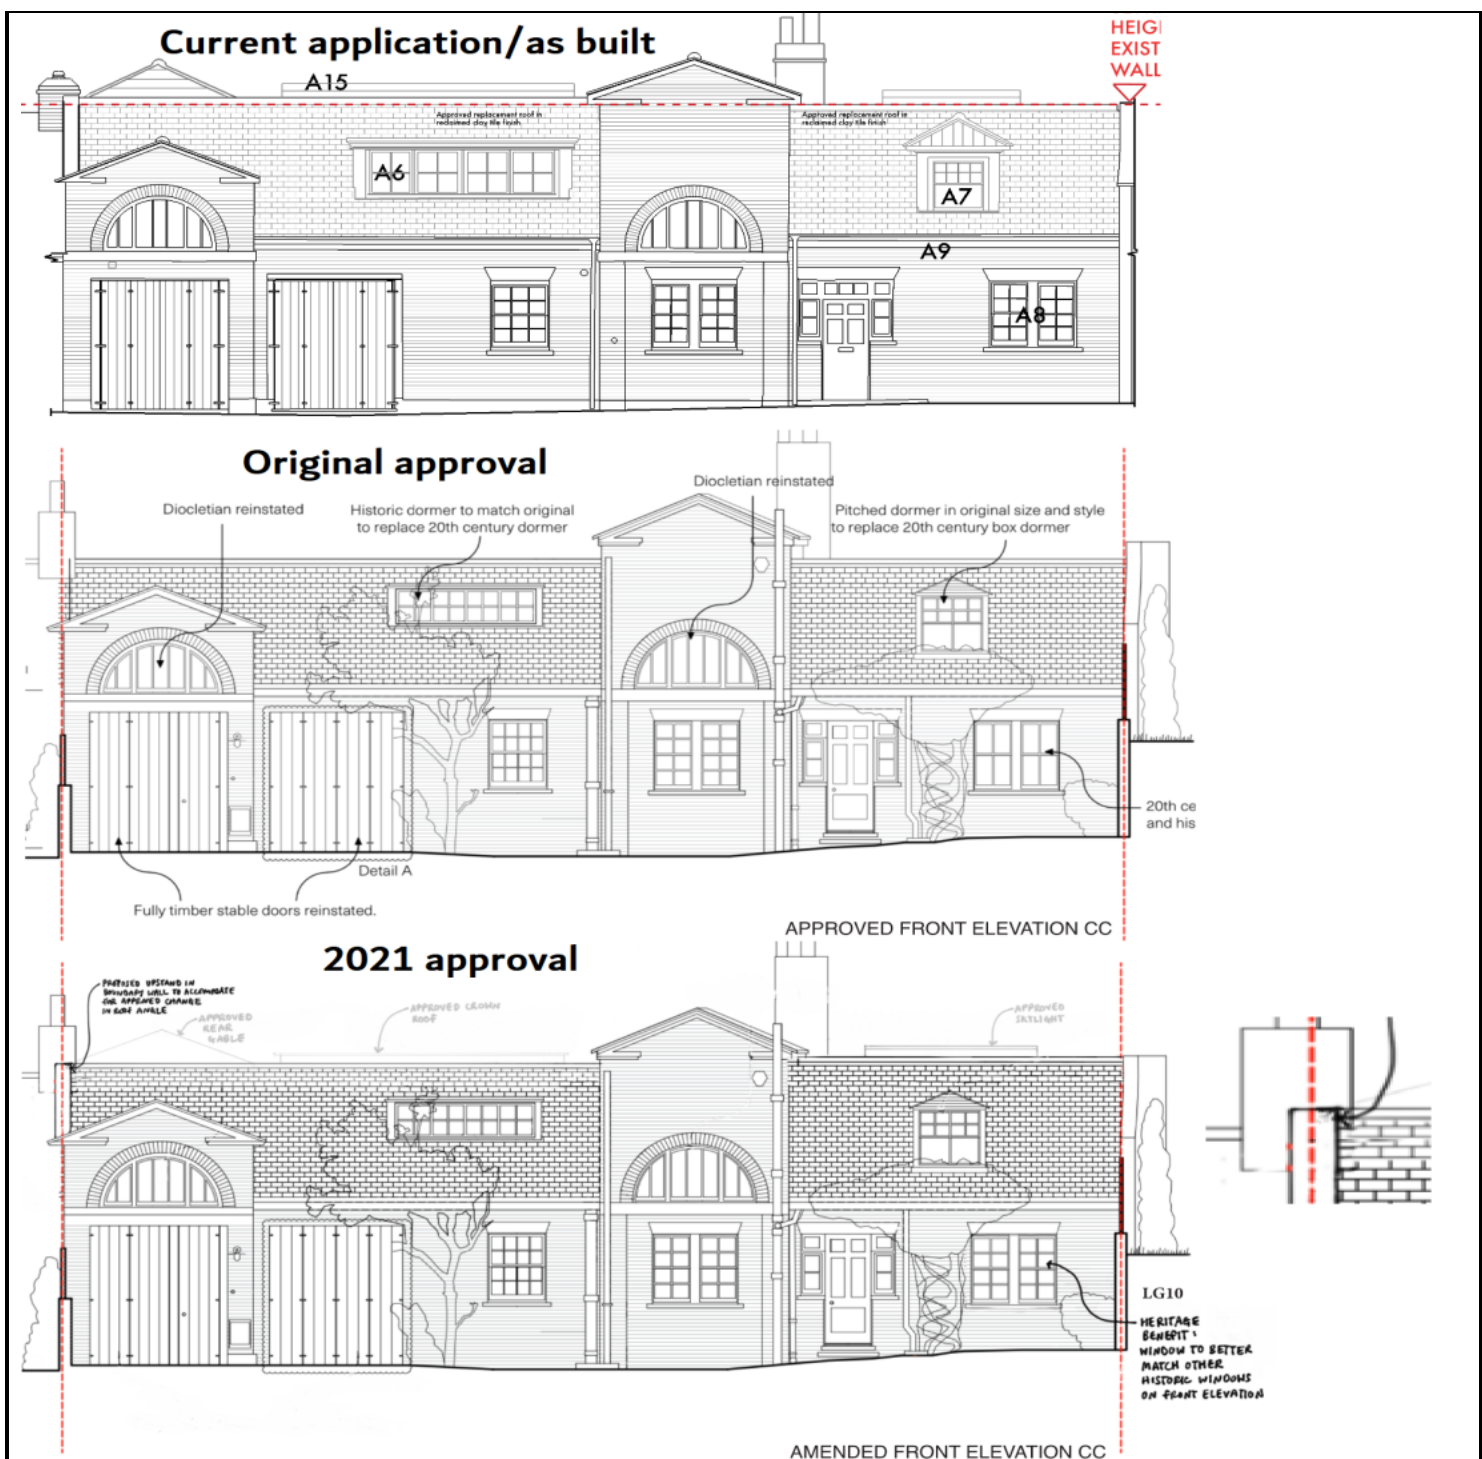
As built elevation showing increased height in firebreak and ridge height as compared to proposed front elevation submitted as part of applications 2019/6089/P and 2019/6100/L and 2021/0409/P and 2021/0406/L
